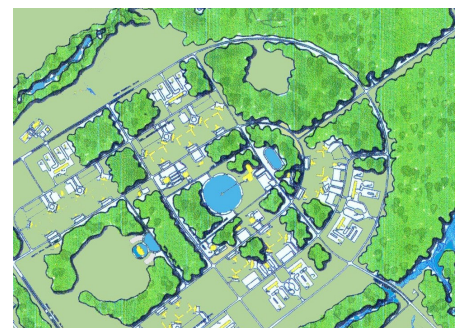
Site planning establishes the arrangement of facilities on a development site.
